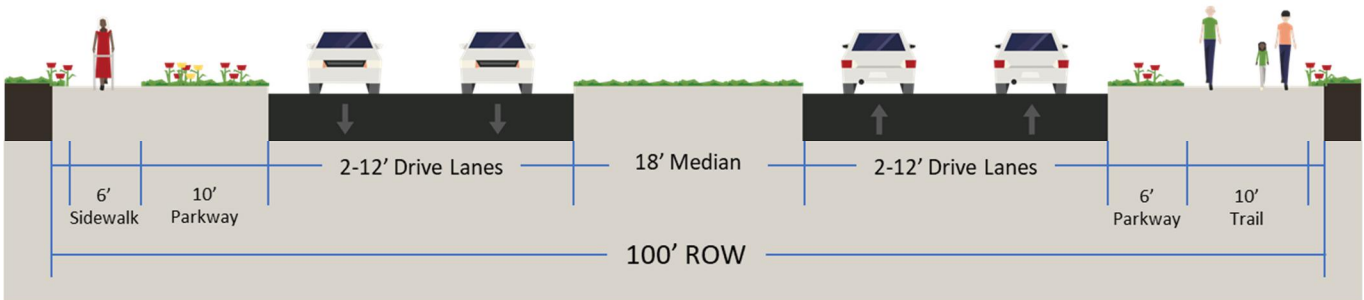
Proposed Cross Section: 4-Lane Divided Arterial – Sidewalk vs. Trail Option
